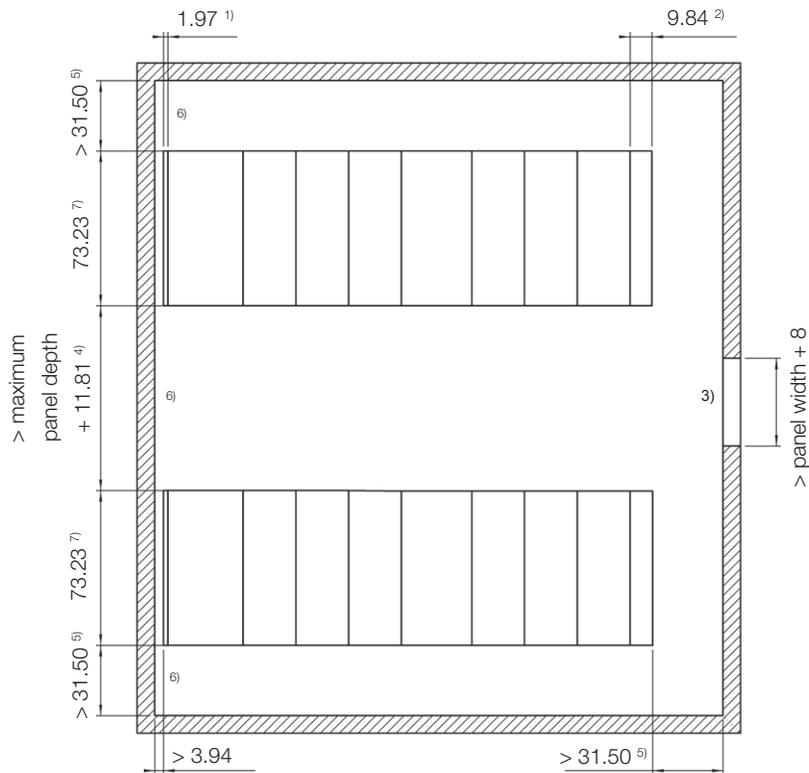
Example of a double row installation (Top view, dimensions in inches)
